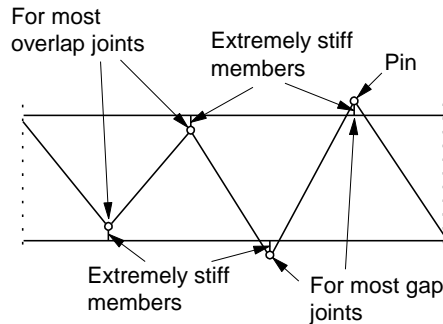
Plane frame joint modelling assumptions to obtain realistic forces for member design
